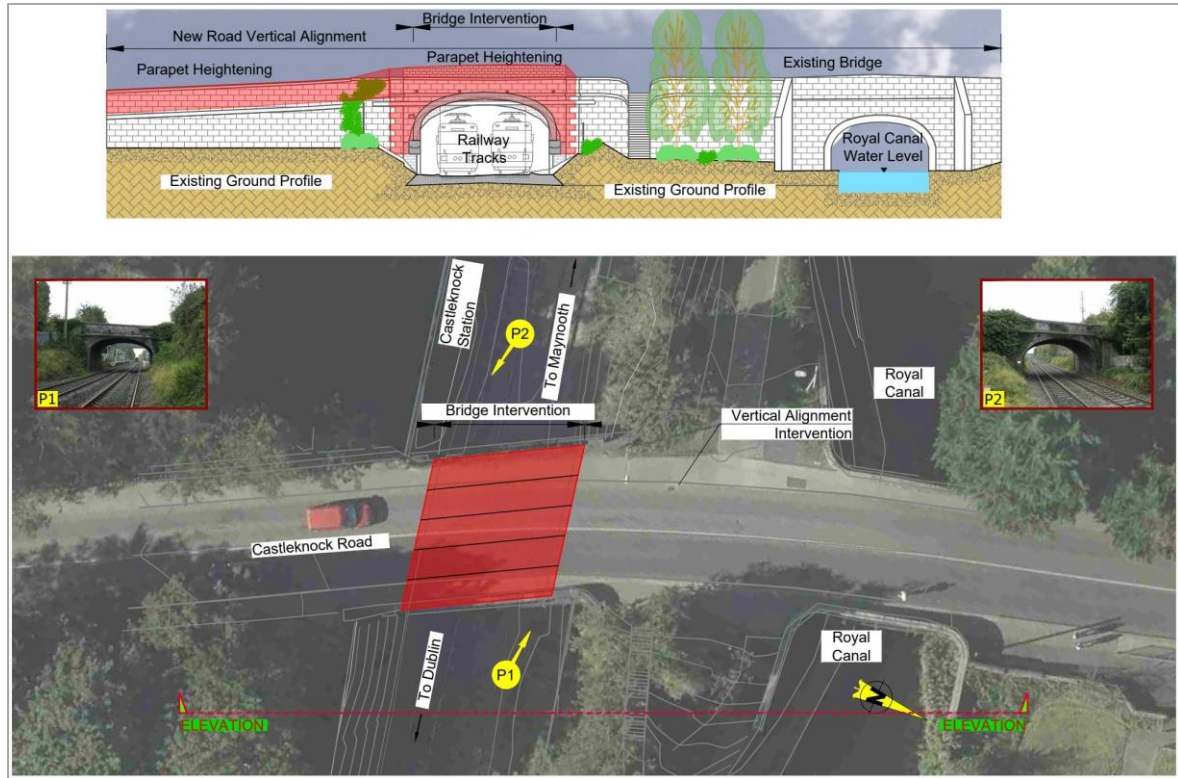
Deck reconstruction of Castleknock Road bridge
